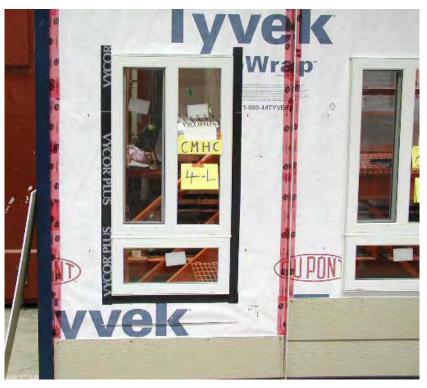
Specimen W4 B-side only: Installation of a strip (50-mm) of waterproof membrane sealing the WRB to the window flange
